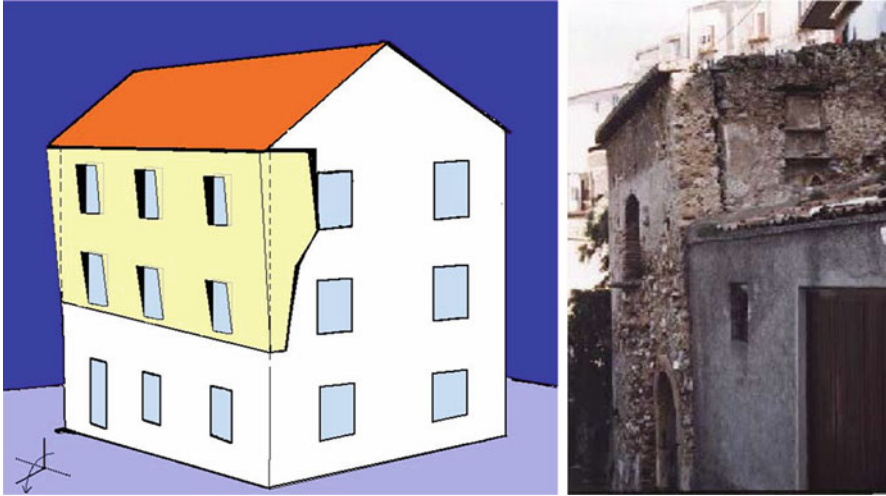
Global overturning of a multi story wall (Milano et al. 2008)
